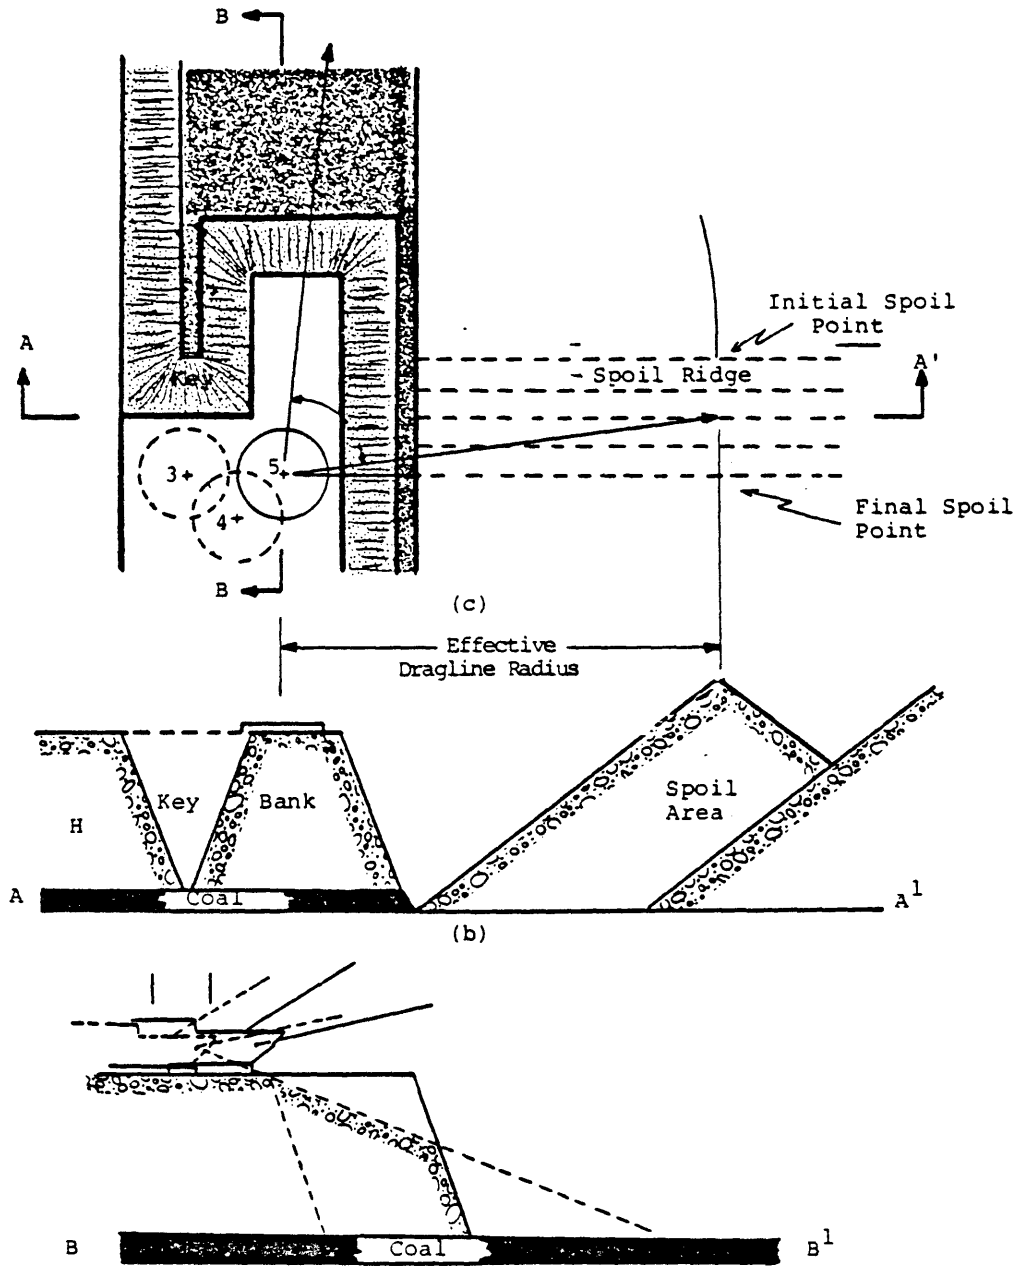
Dragline Spoil Ridge Location for Main Cut Position in Plan and Cross Section.
